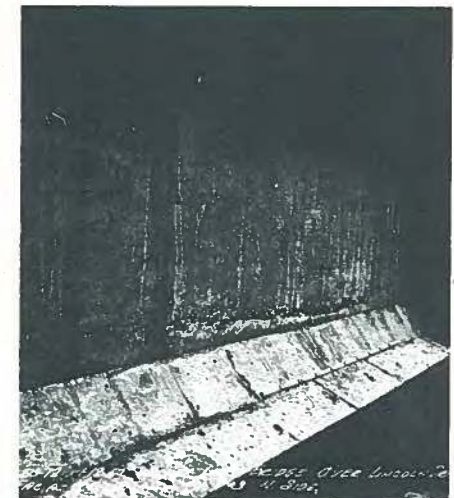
Appearance of first bridge girder cast (fascia girder).
